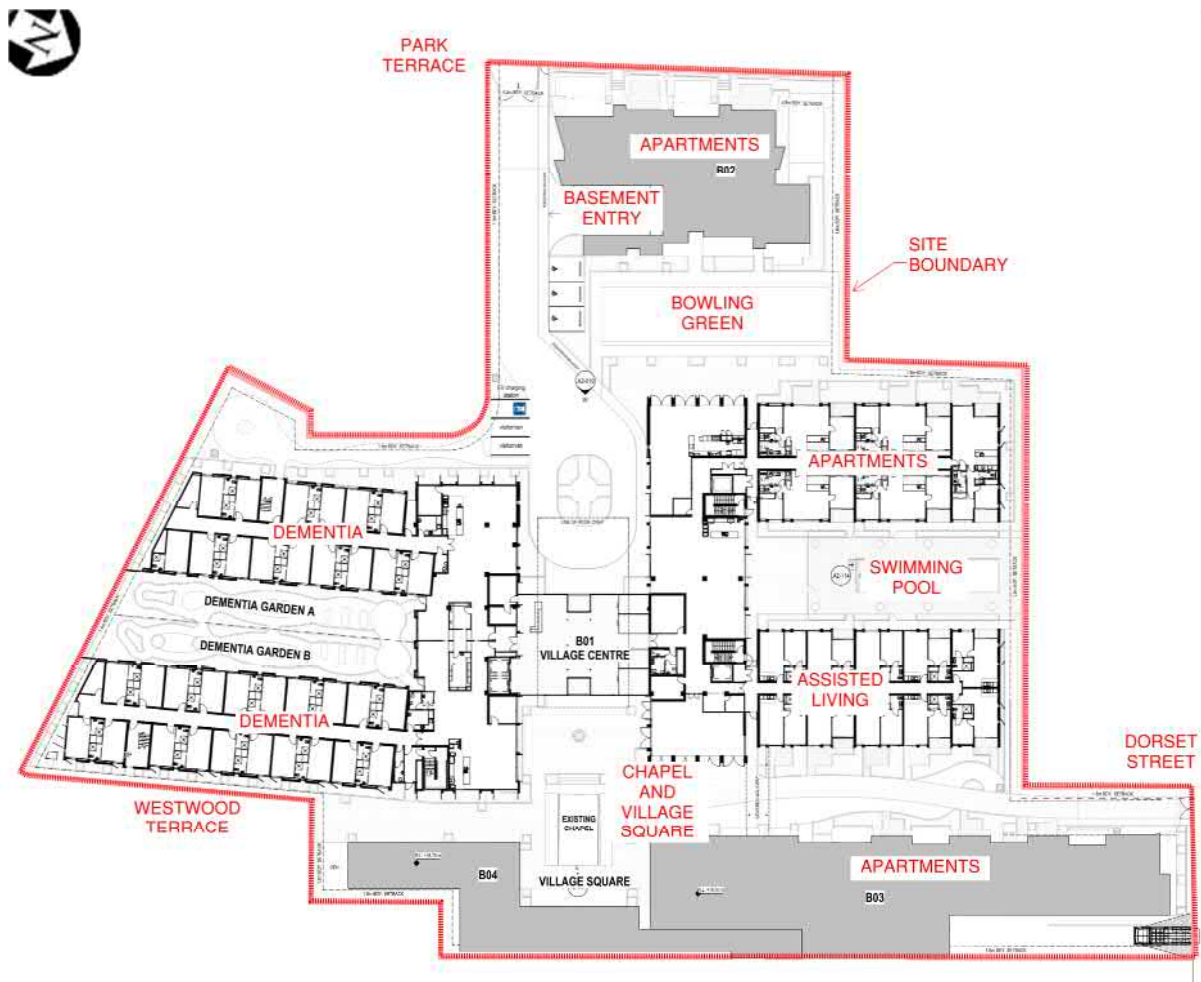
Site 1 Bishopspark Proposed Site Layout
